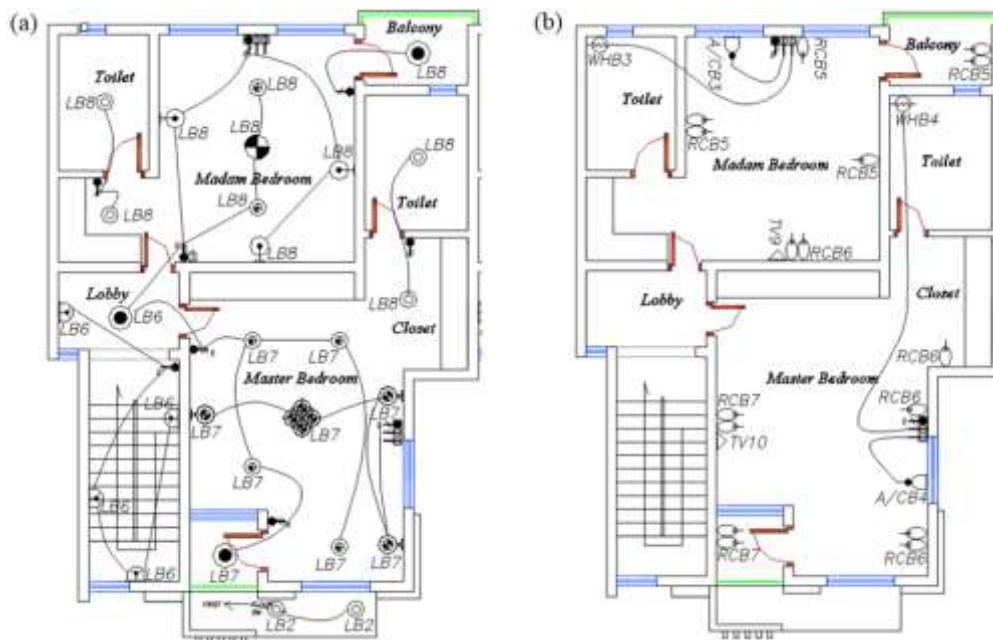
Electrical Layout of (a) Lighting Point and (b) PowerPoint on Second Floor
